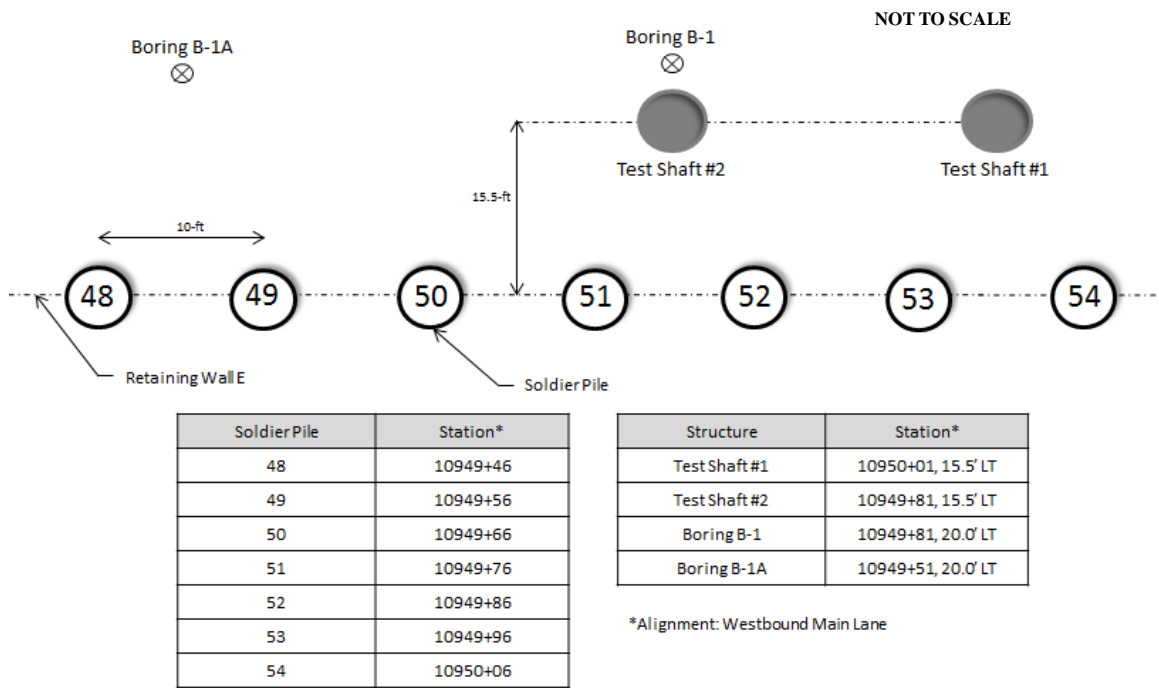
Plan View of Test Shaft and Boring Layout in Relation to Alignment: West Bound Main Lane
